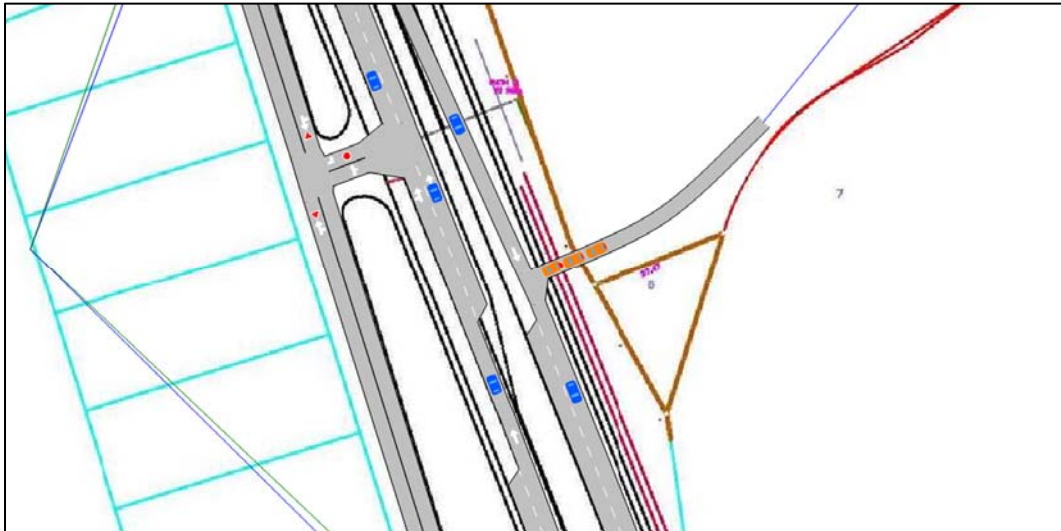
Tweed Coast Road / Rural Retail Exit Intersection
